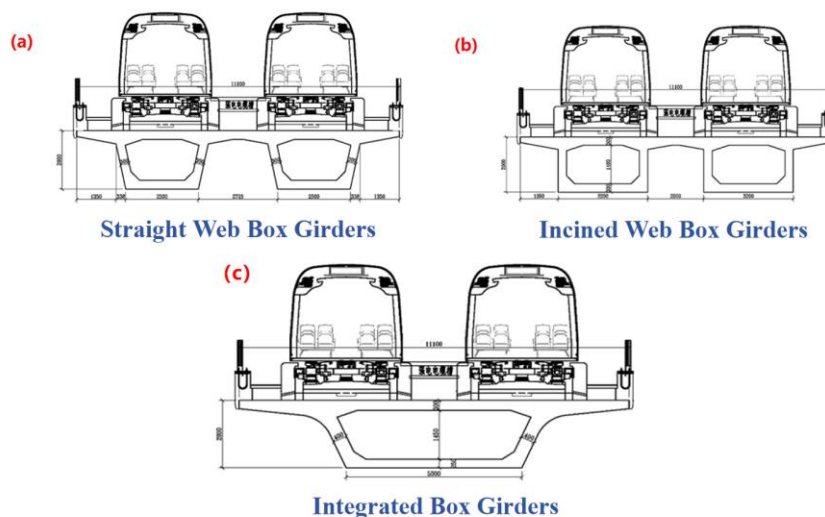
Structural designs for elevated bridges in high-speed HTS pinning maglev systems: (a) straight web box girders, (b) inclined web box girders and (c) integrated box girders.
